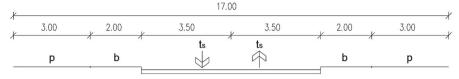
Geometrical cross-section of Boris Krajger – West [source: Author]
